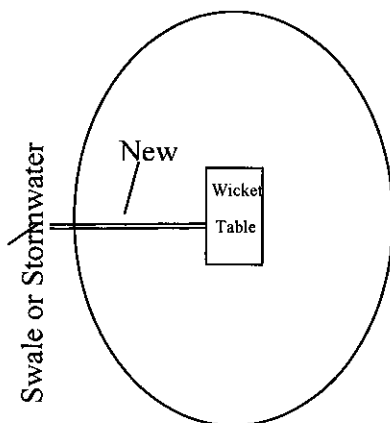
Shows a drain that shall run from the centre of the wicket table, connecting into a swale or stormwater pipe
